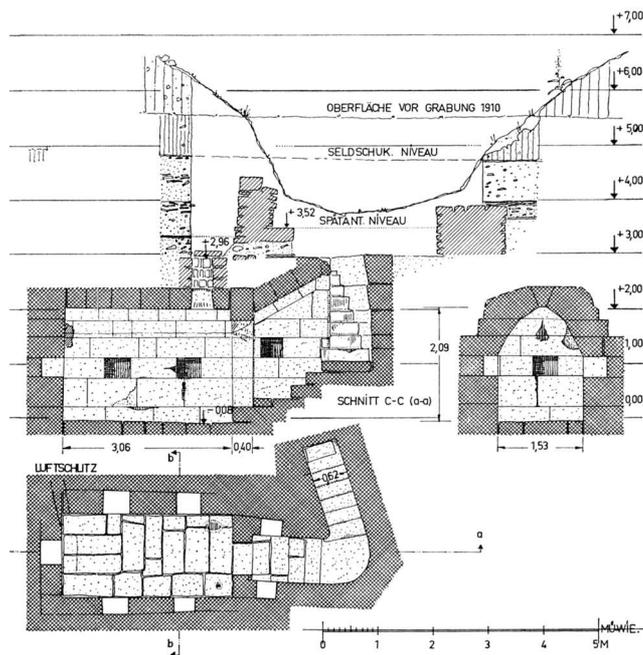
Subterranean chamber west of the *bouleuterion*, Hellenistic(?), groundplan, longitudinal and cross section (sketch W. Müller-Wiener in: Müller-Wiener 1972, Beilage 6).
